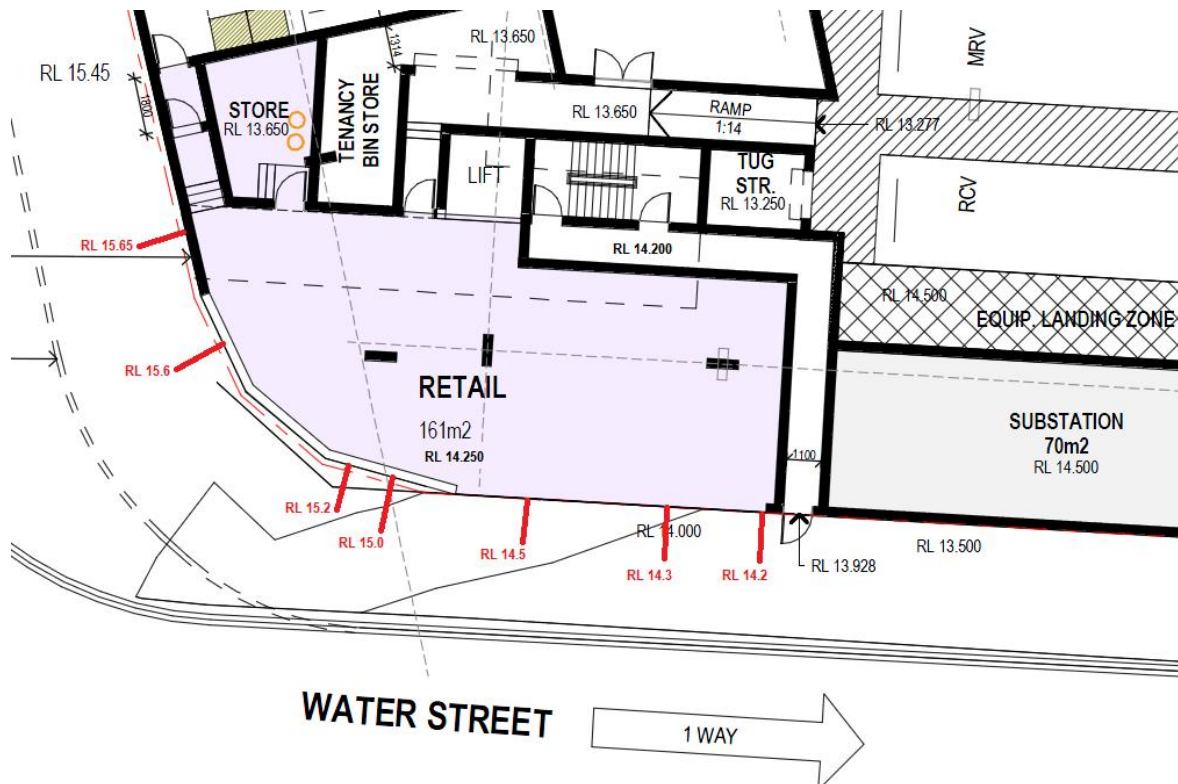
Central Village Phase 2 161m² Retail Area Floor Level
